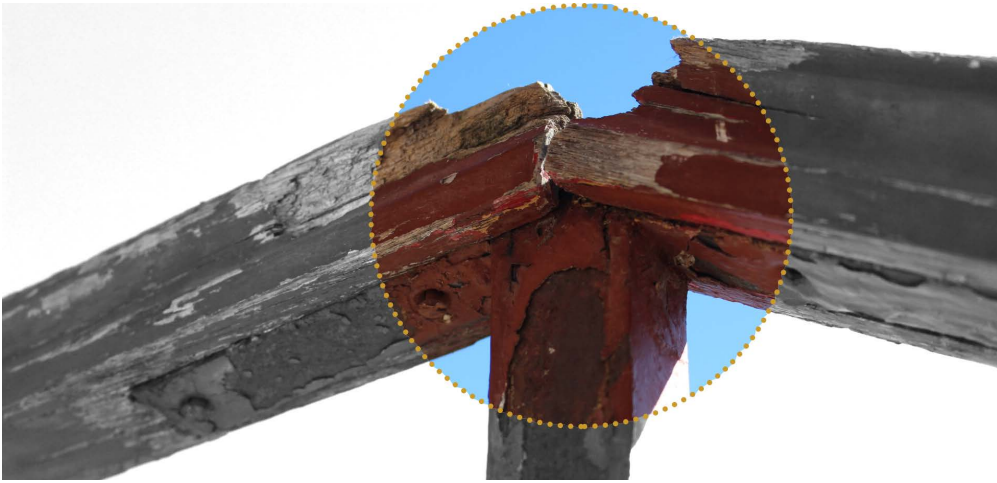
Balustrades and exterior timber elements shows extreme wear and neglect. The exterior details of a building can indicate the level of attention it gets.
